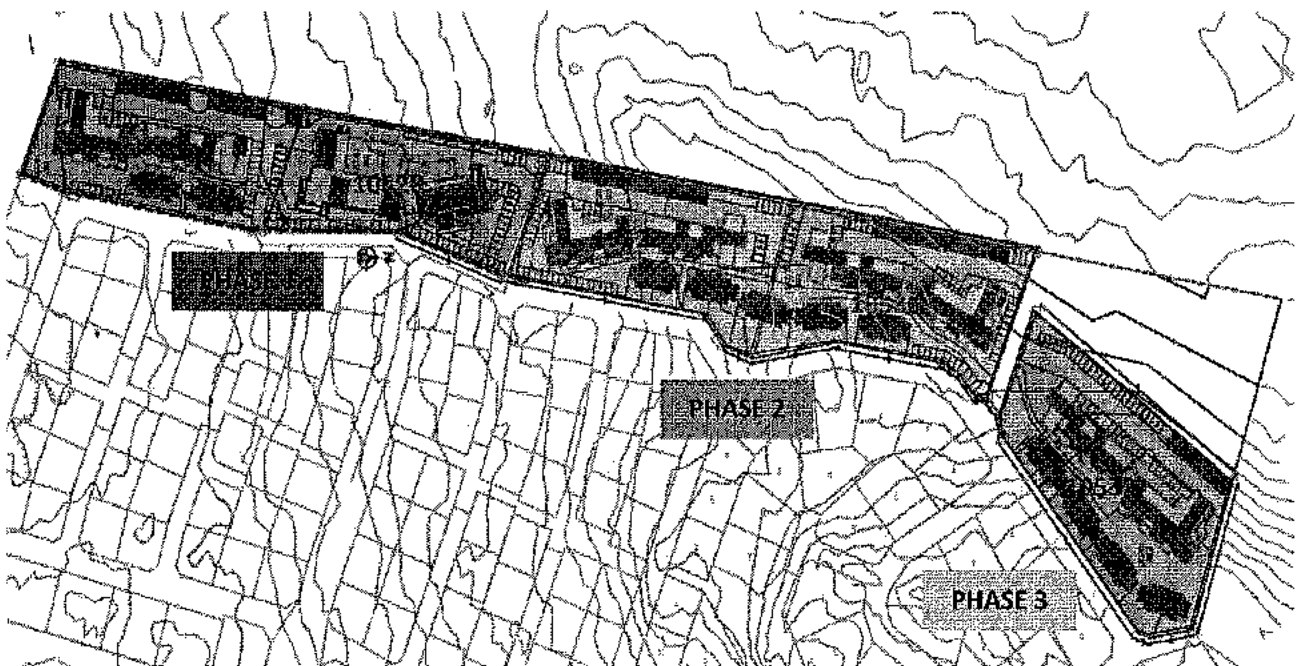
Phasing Plan (Finlayson Van Der Merwe Architects)
